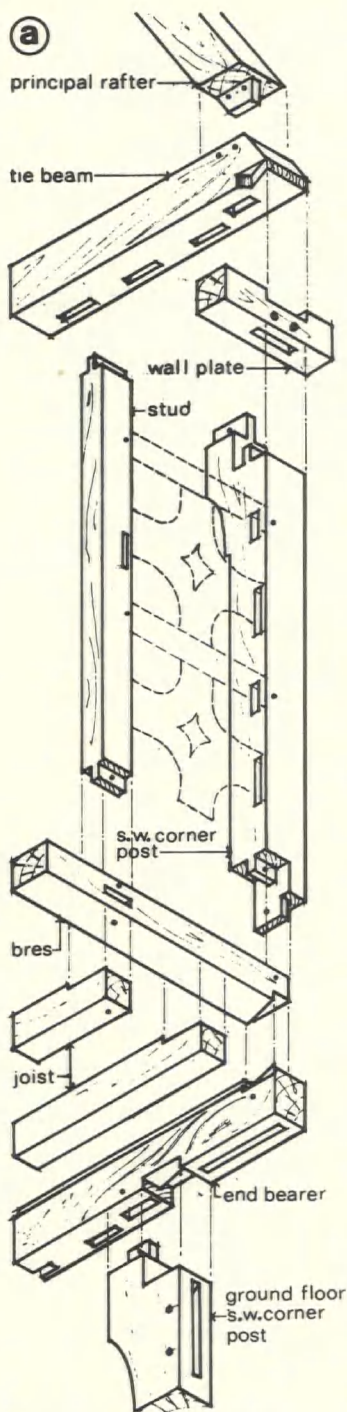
Isometric reconstruction of the original frame of Calcott Farm, Houghton Regis, West gable infill and east wing studs conjectural; decorative infill panels shown are based on the mortise joint evidence.
